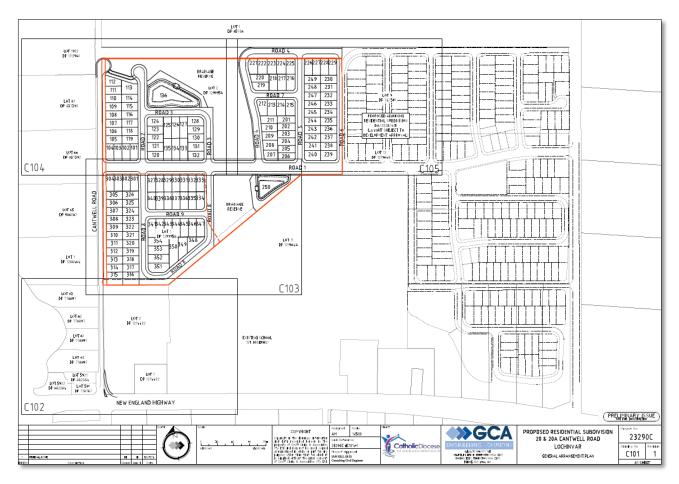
General Arrangement Plan - Proposed Adjoining Development
